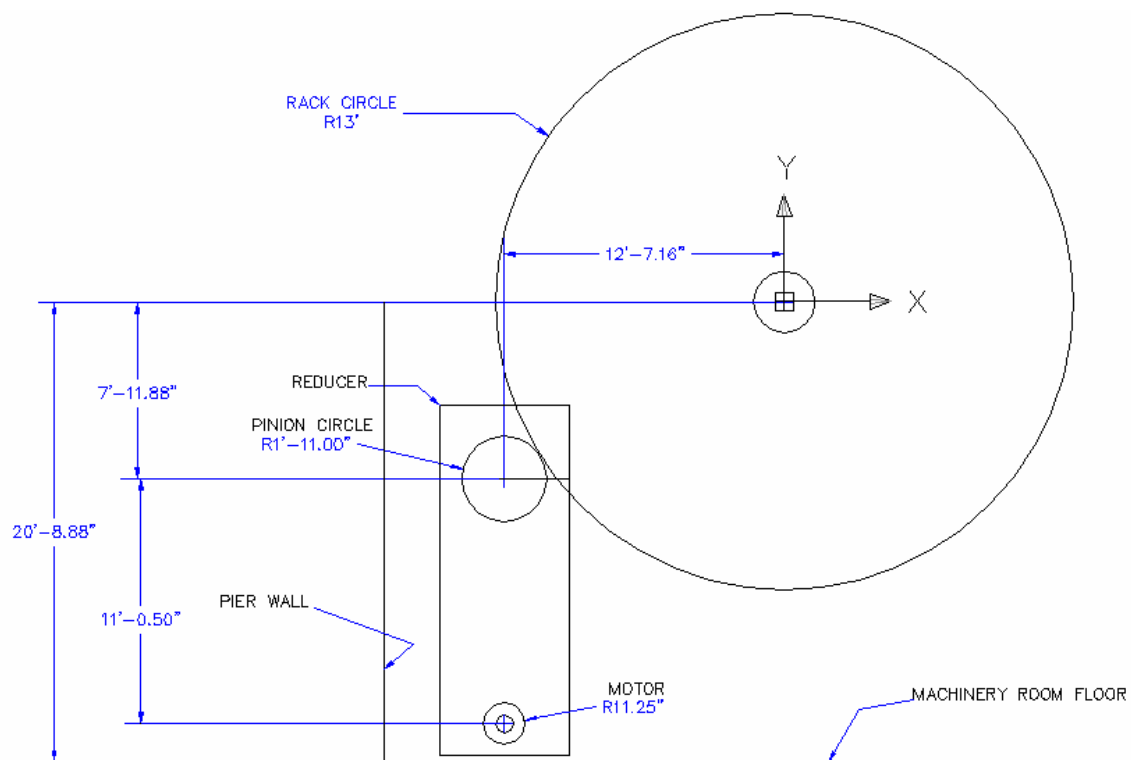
Machinery Plan and Elevation for 3rd St. Bridge
